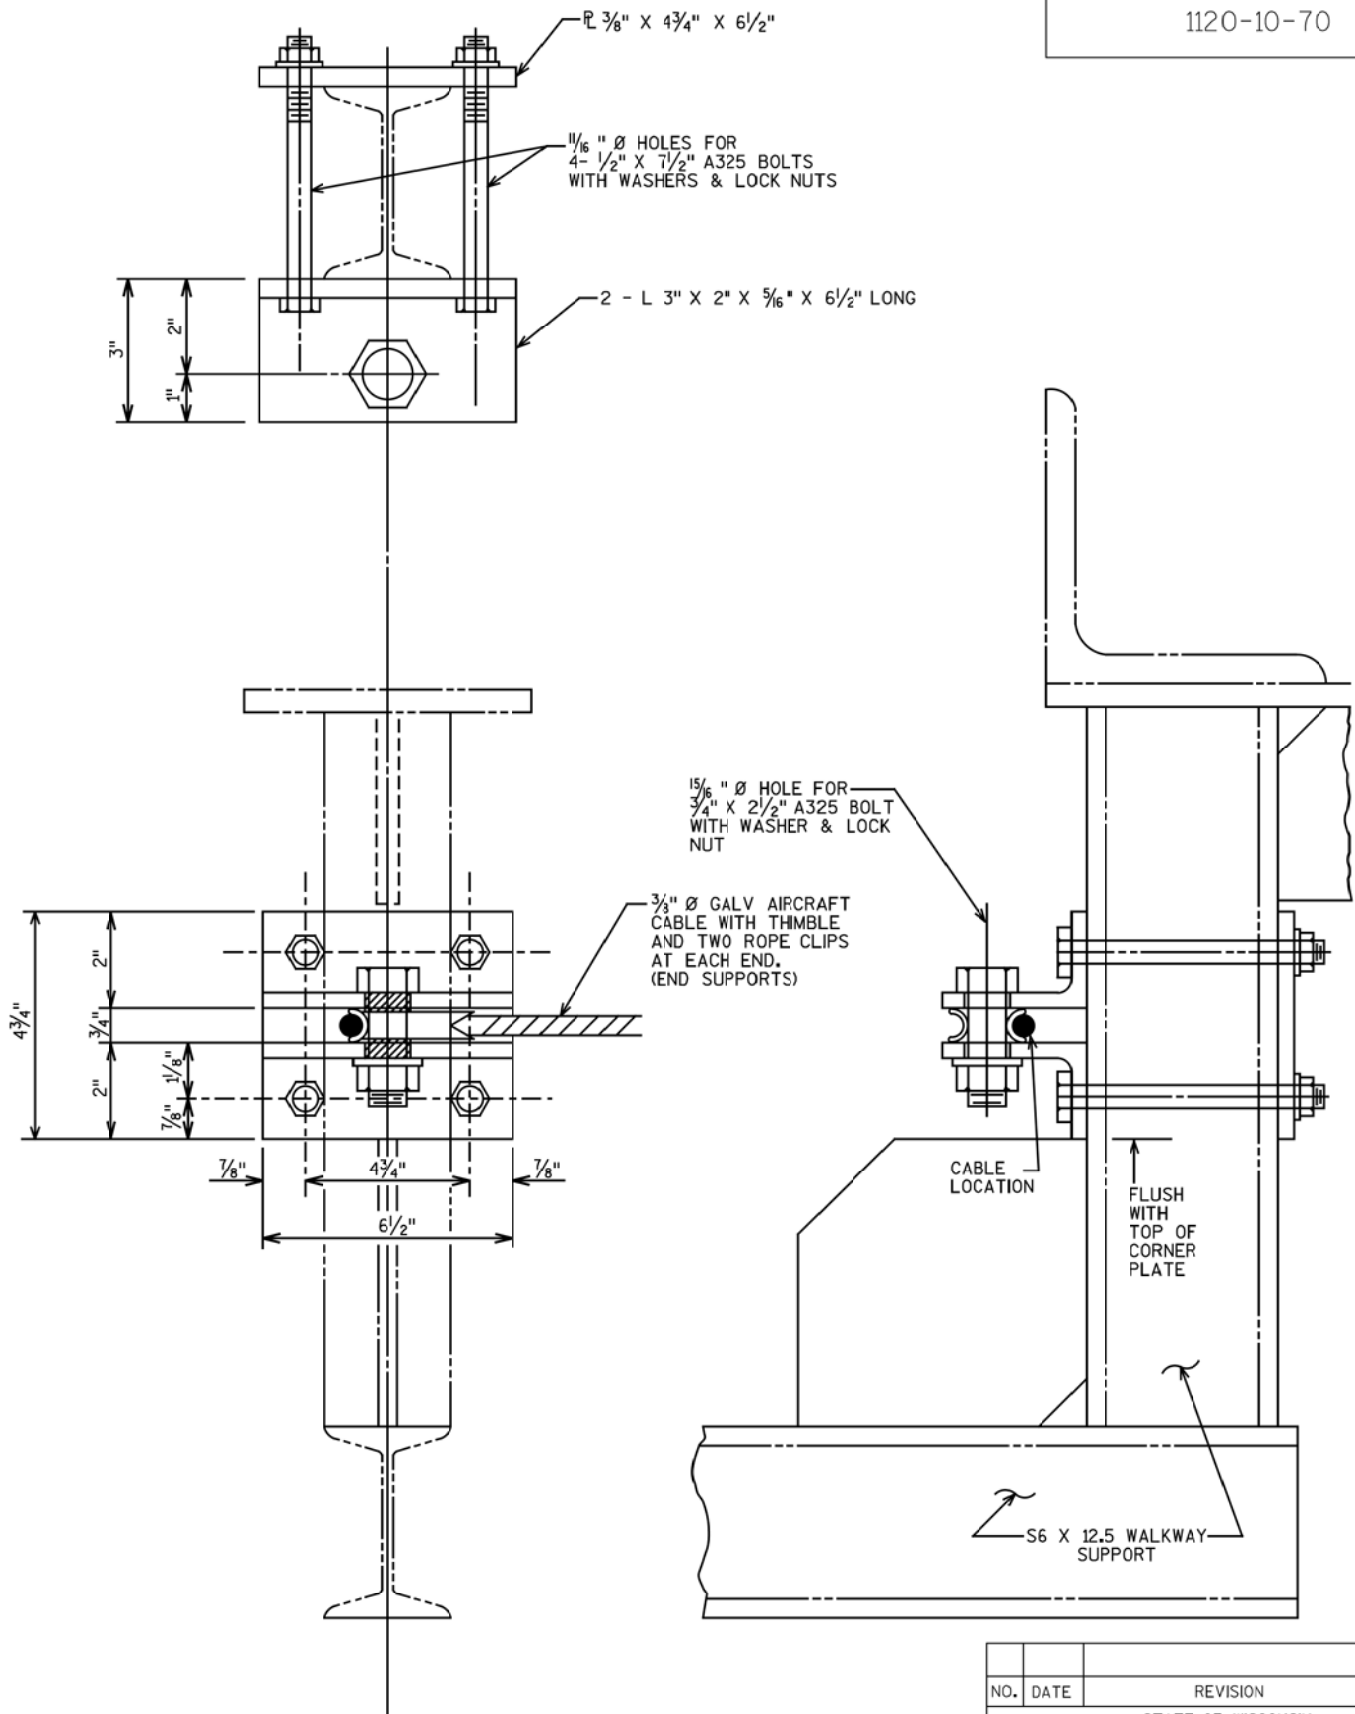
DETAIL "A"DETAIL "B"RAIL POST DETAILTYPICAL RAILING DETAILS
